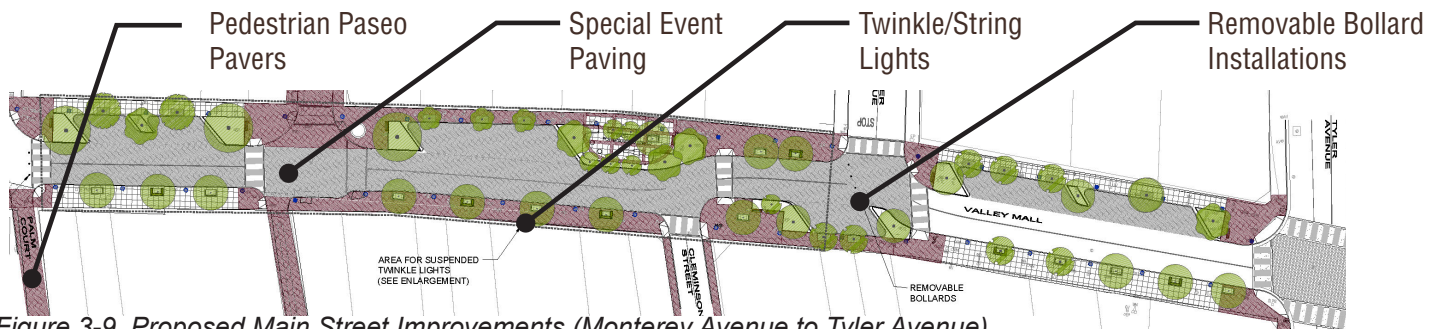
Proposed Main Street Improvements (Monterey Avenue to Tyler Avenue).
